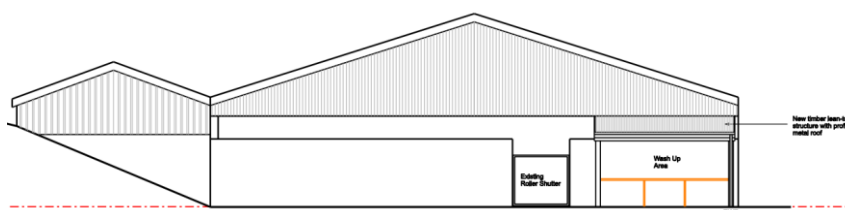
Extract from the south elevation drawing showing the proposed washing up area and lean-to shelter.
